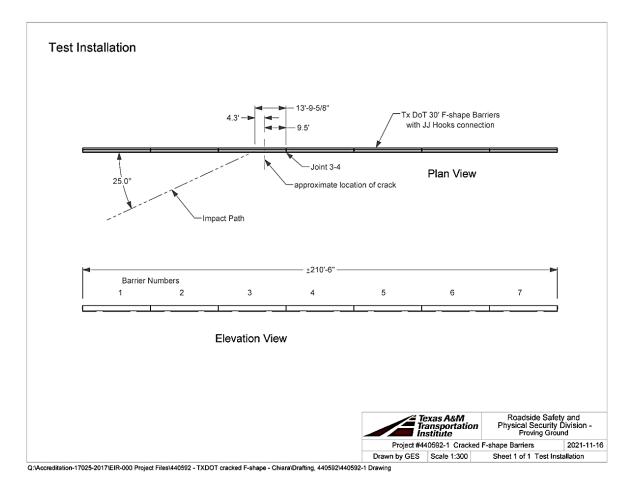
Test Installation Layout for Test No. 440592-1.
